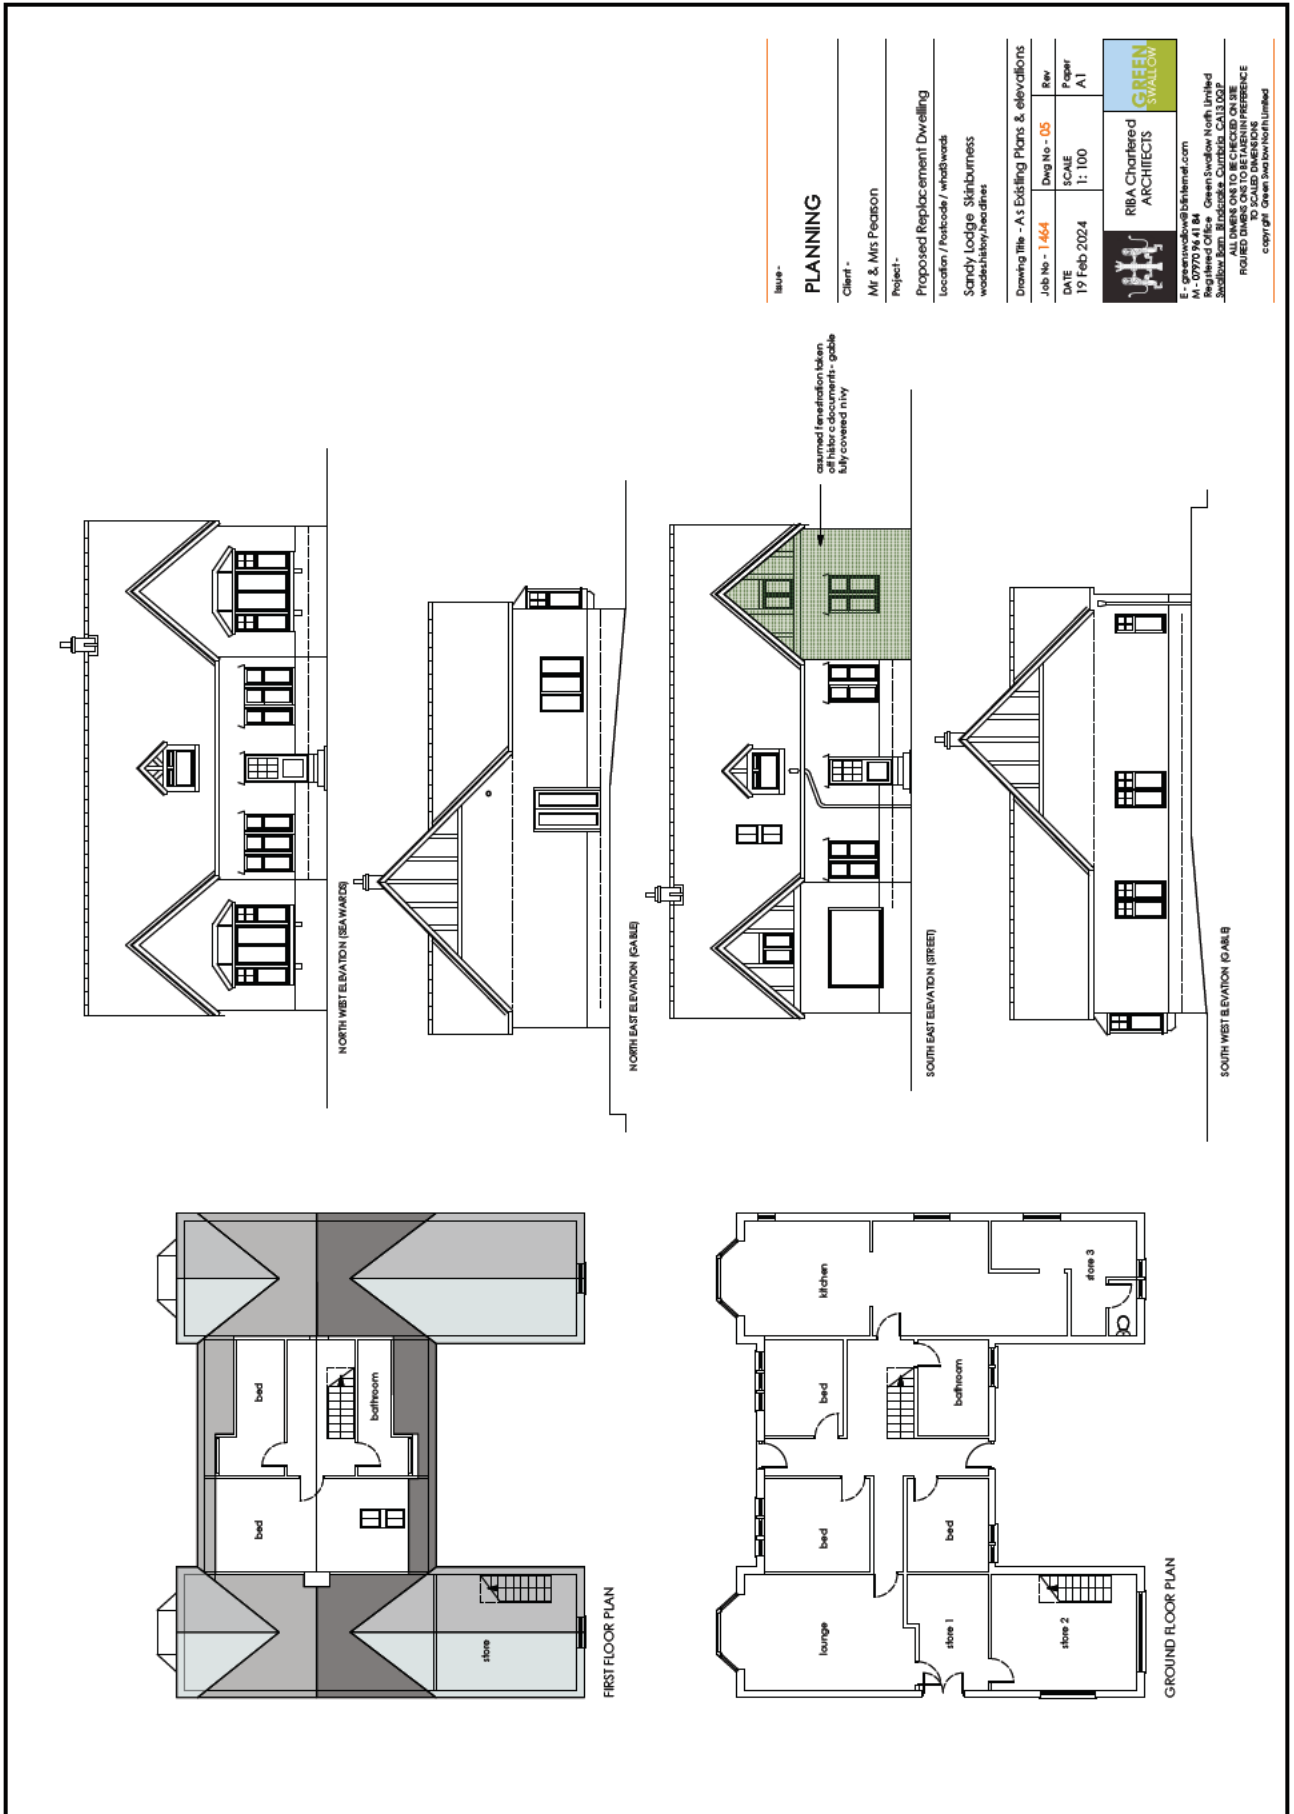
Proposed Replacement Dwelling - Sandy Lodge, Skinburness; As Existing Plans and Elevations. Drawing No. 1464 05 -, by Green Swallow North Ltd.
